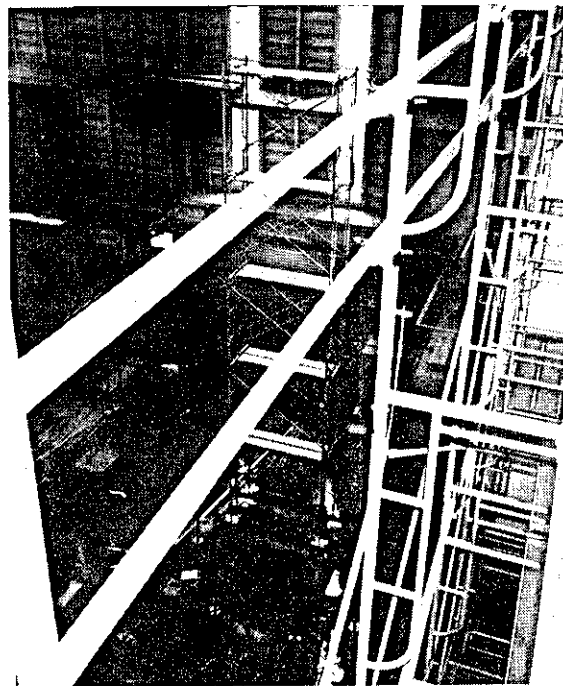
Handrail (two pipes at height of 90 & 45 cm).
